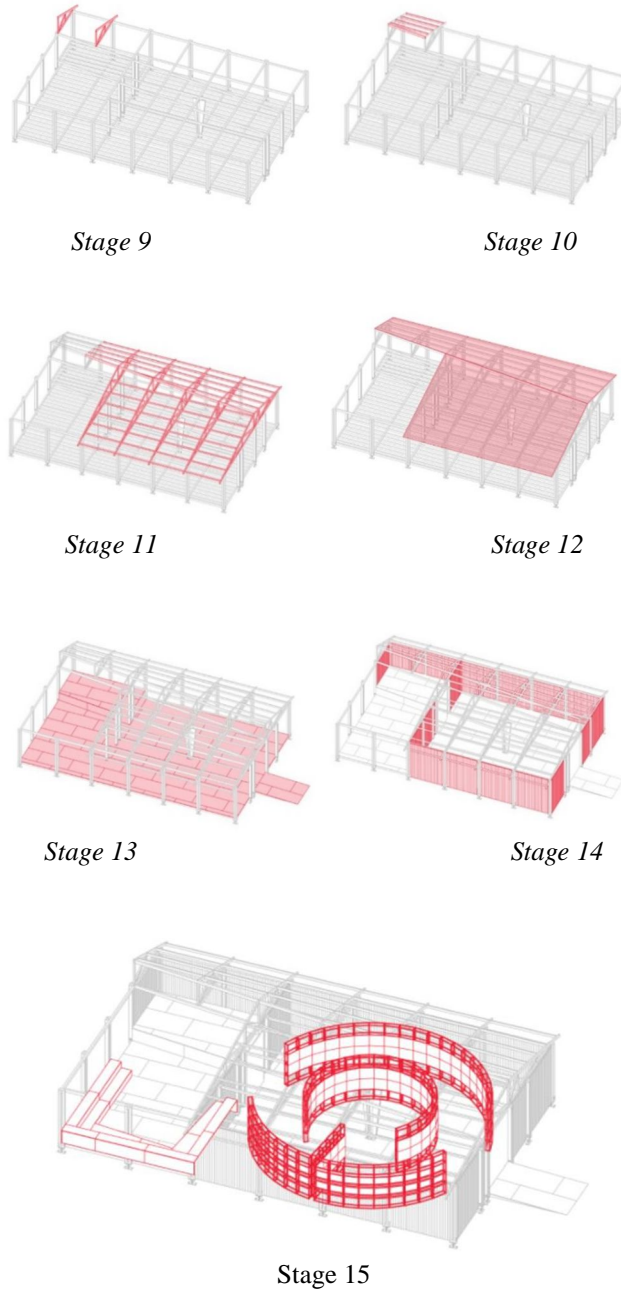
Stages of Construction, source:[www.archdaily.com](http://www.archdaily.com)
